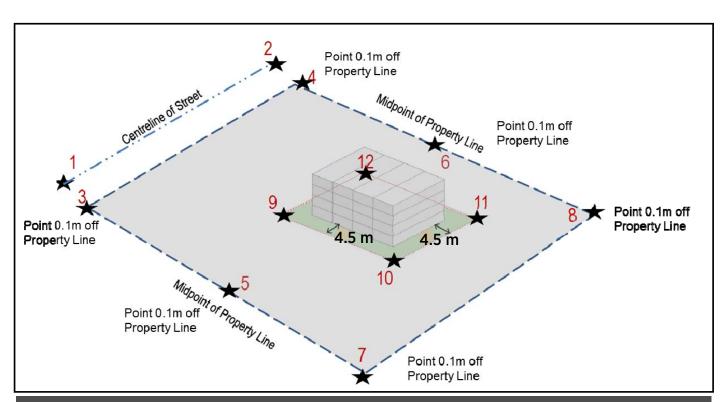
Context Grade: The average of 12 Points. 8 of which are around the perimeter of the site and 4 points located 4.5 m around each building
